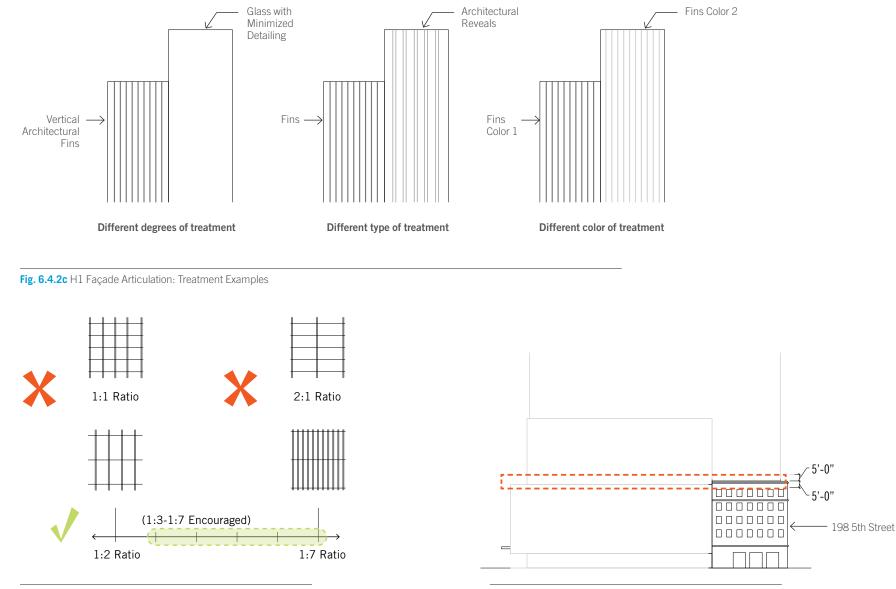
H1 Façade Articulation: Vertical Façade Proportions
